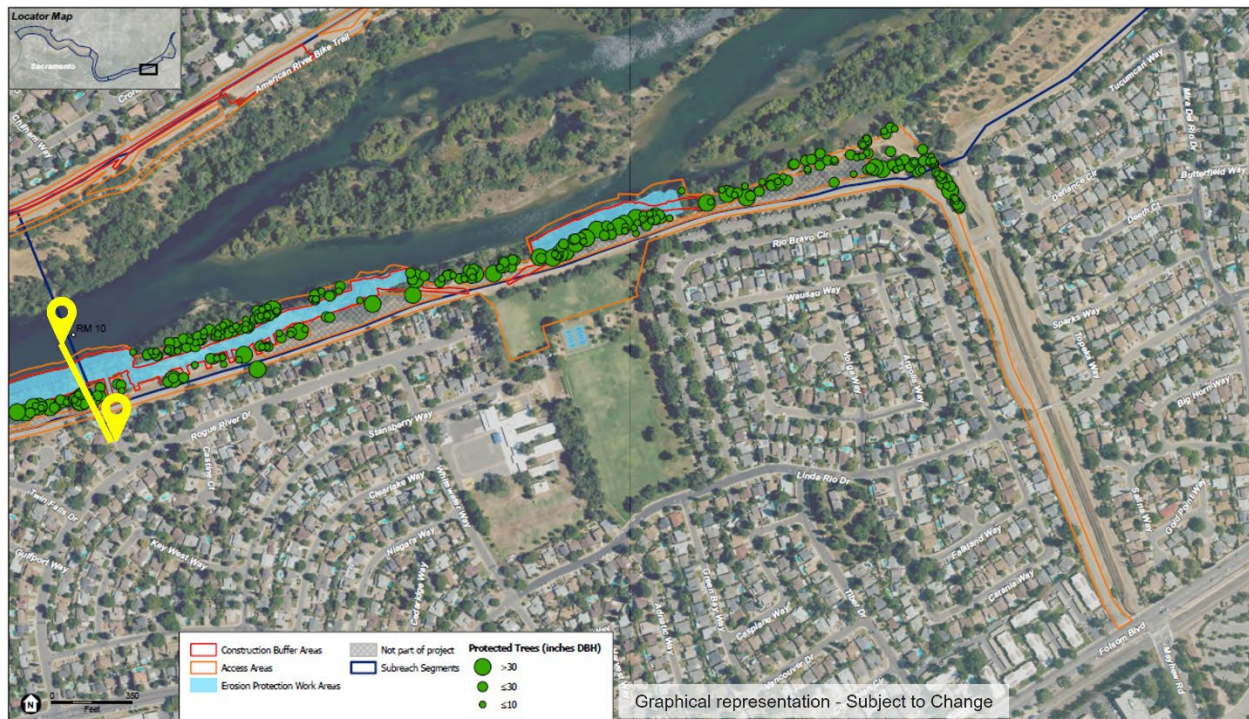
Layout of Segment 3-6 erosion protection feature and cross section location
